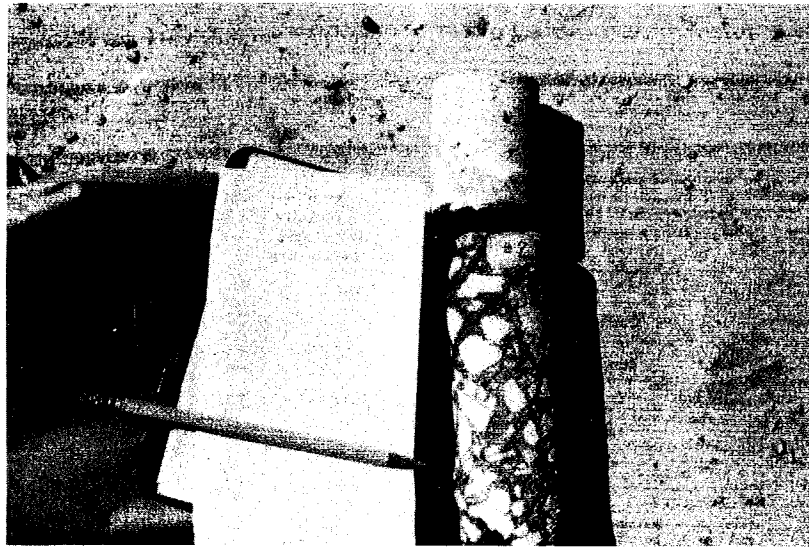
Two-in. Cores from Bosque River Bridge Showing Breaks at Bond Line. Also, note Cracked Overlay in 4-Span 1 Specimen.
